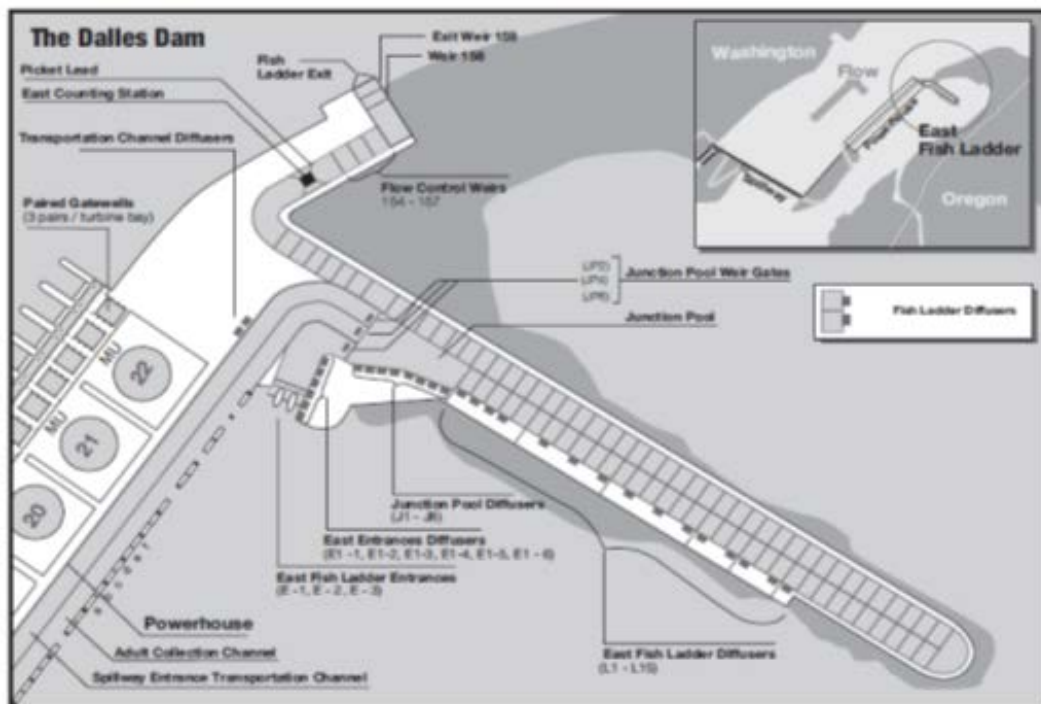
The Dalles Dam East Fish Ladder (USACE 2008)
